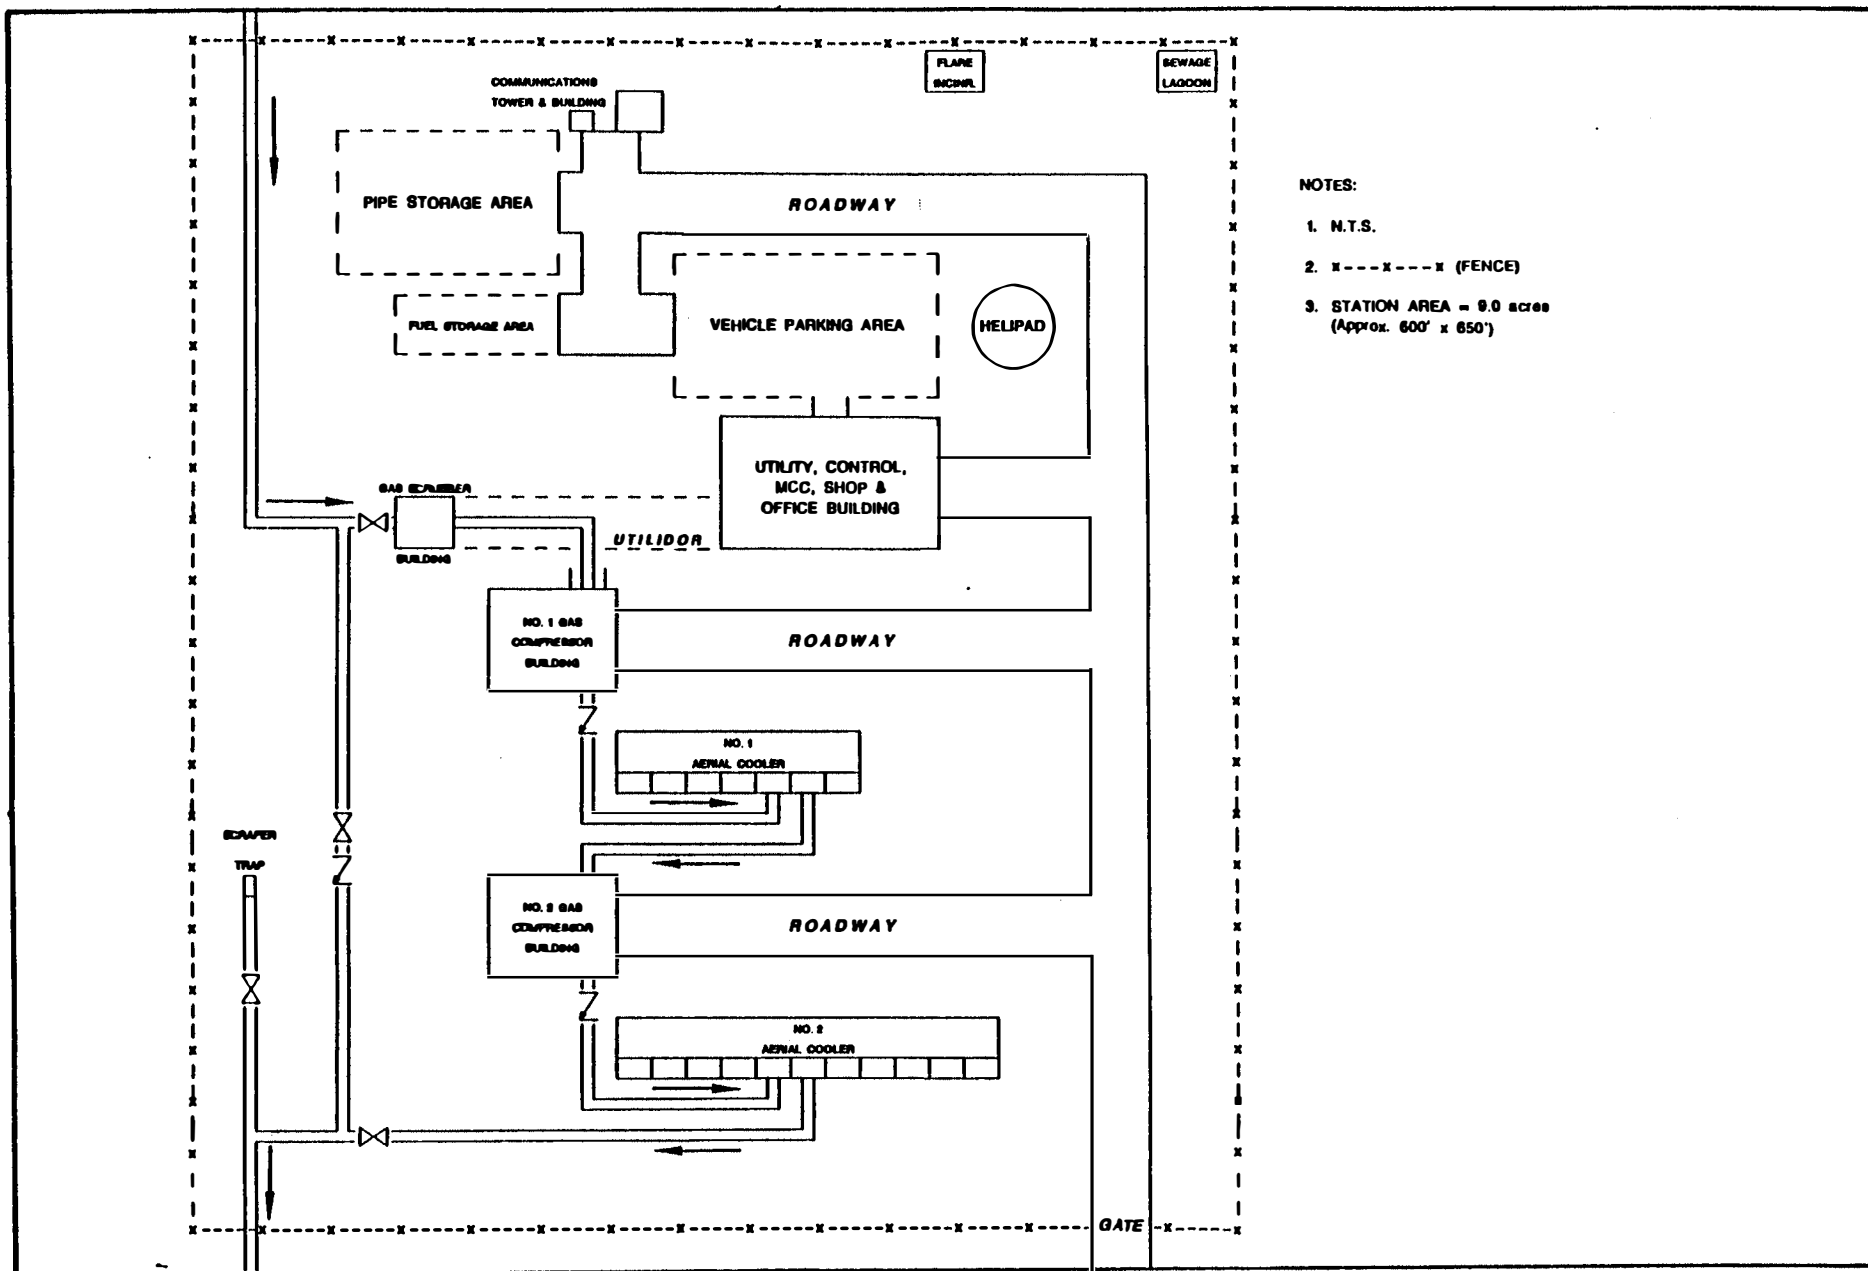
PROPOSED PLOT PLAN COMPRESSOR STATION NO. 1 (Wild Horse, Montana)
